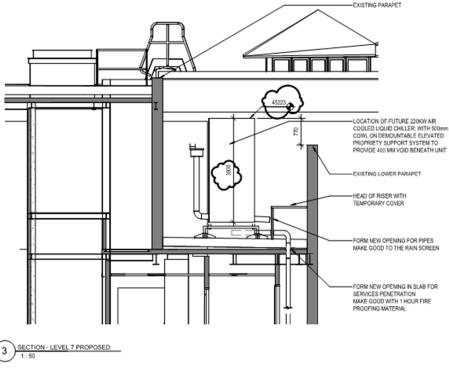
PROPOSED SECTION OF A HIGHER PLANT ON ROOF DECK
